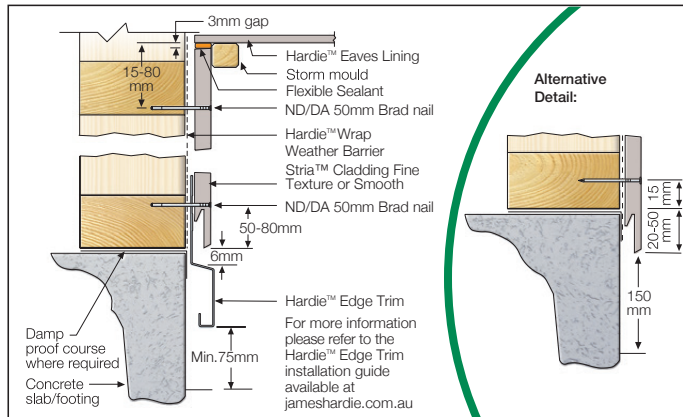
SLAB/EAVE JUNCTION DETAIL
